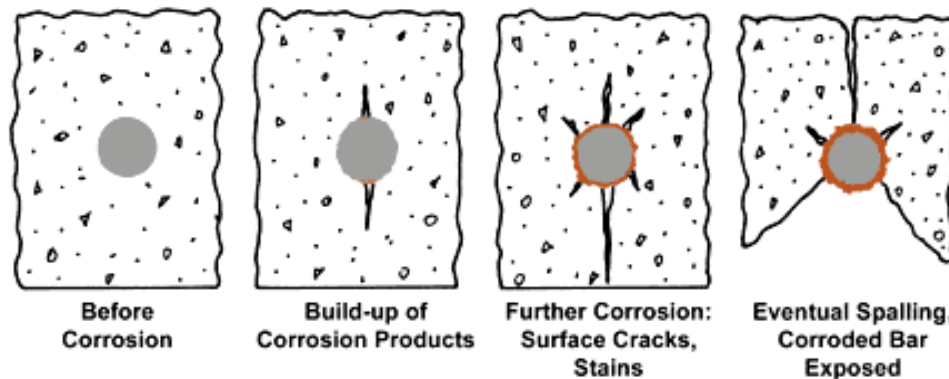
Cracking and spalling of concrete caused by corrosion (from (Rourke, 2008))
